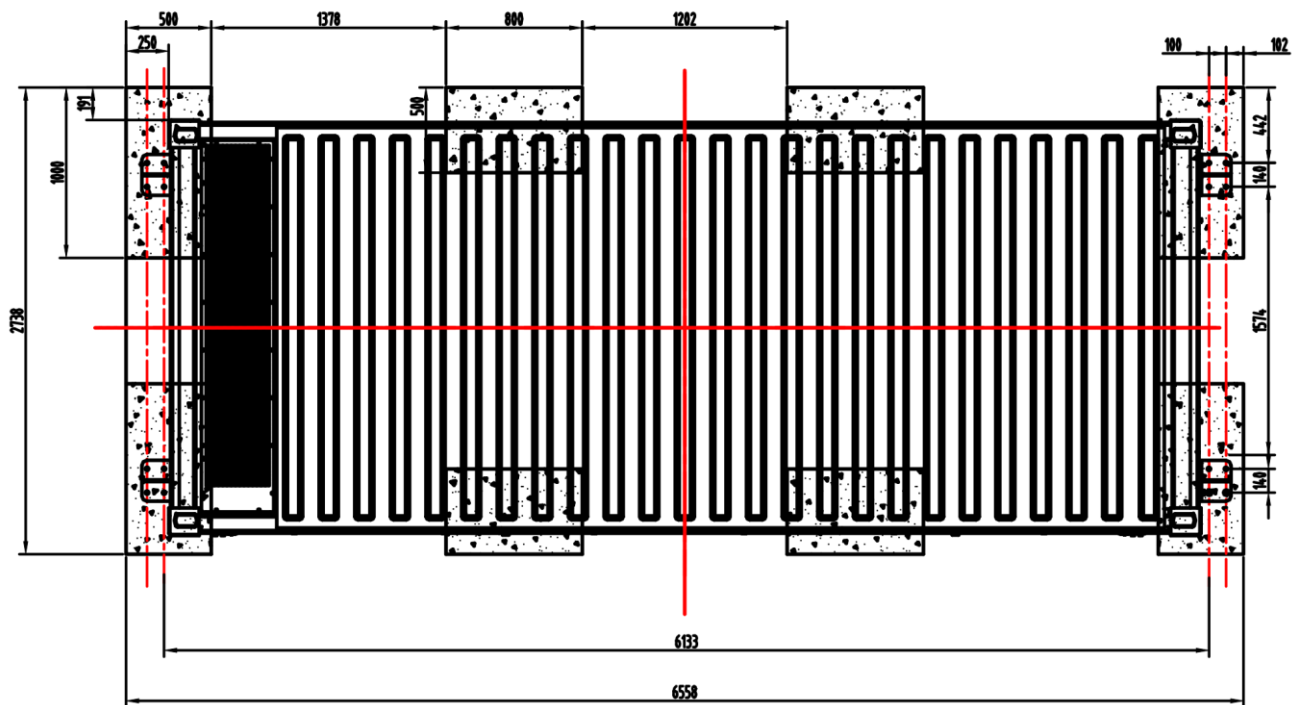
Top View of Installation Foundation (Unit: mm)
